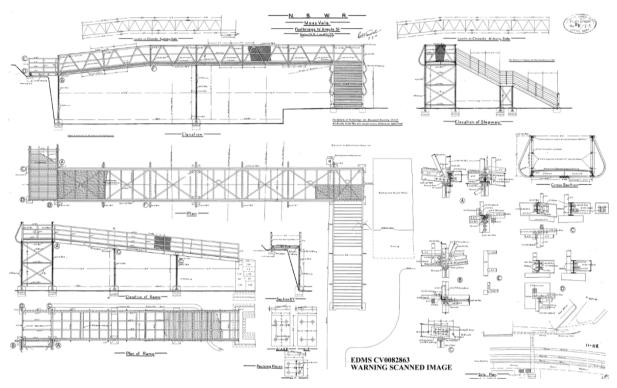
1915 drawings of proposed Argyle Street footbridge (VPR)
